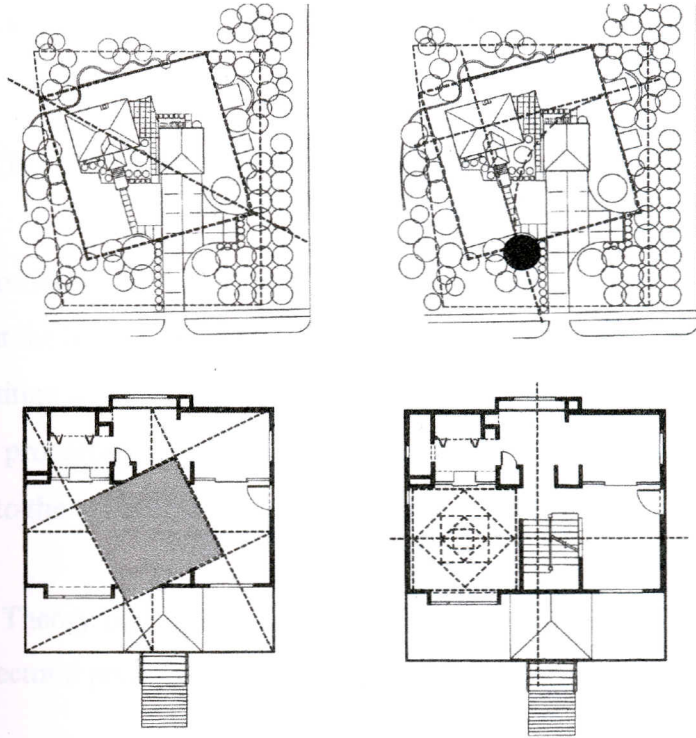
Site Plan and Building Plan datum squares for Watts House
